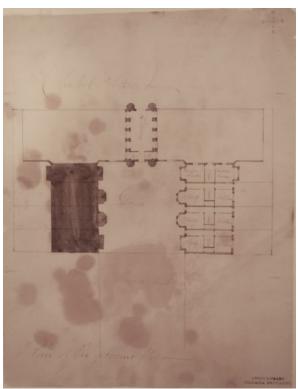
Columbia College, proposal sketch. James Renwick, Sr., 1813.
